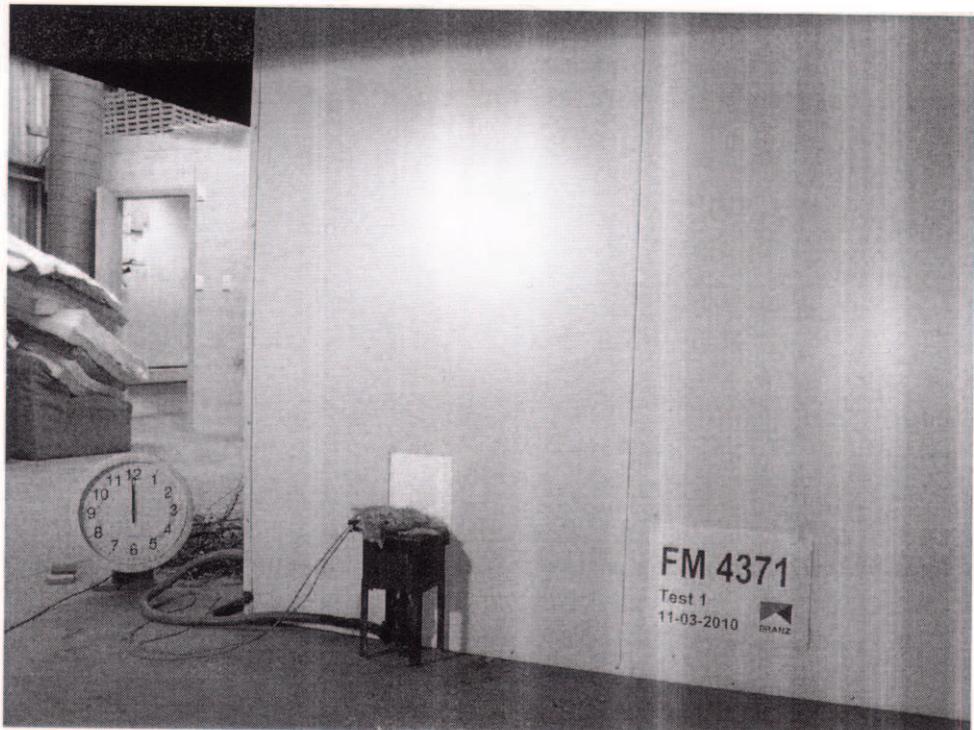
Wall test 1 – start. (same set-up as for Wall test 2)
